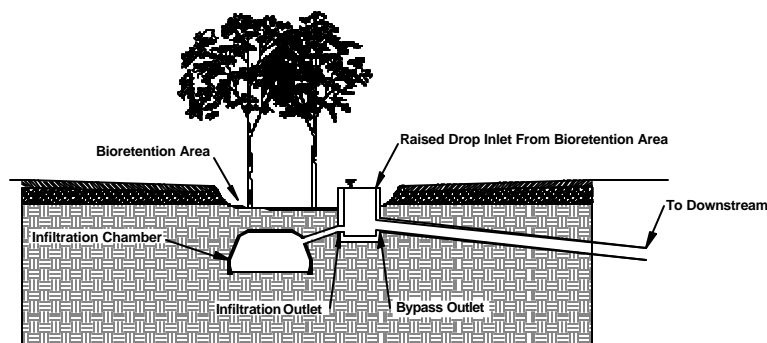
Example split-flow facility: depressed landscape island in parking lot with bioretention area, raised drop-inlet flow-splitter, underground infiltration chamber for diversion flow and bypass to downstream outlet.
